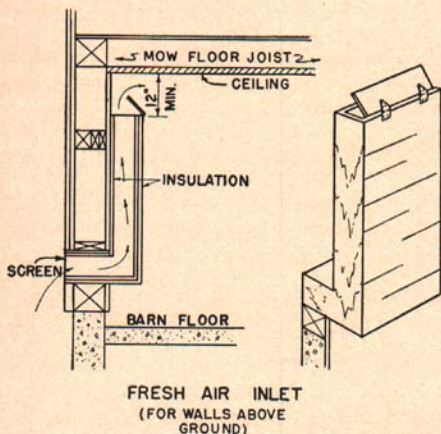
Construction of a fresh air inlet for an old timber-frame barn, in the frame walls above the ground.
